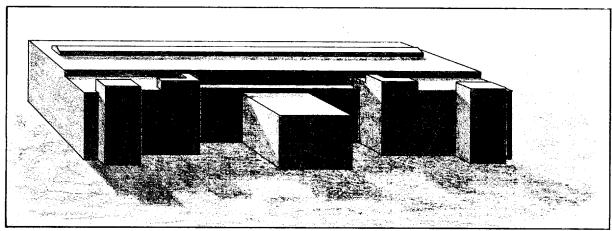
TEST BUILDING OF THE HORIZONTAL TEST SECTION. (Item 19 of Figure 4.)
